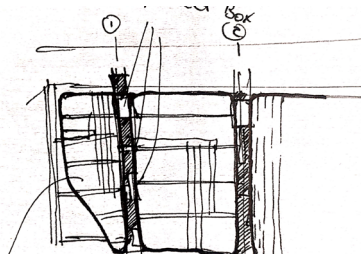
INITIAL IDEA LIVING WALL (AUTHOR 2021)
